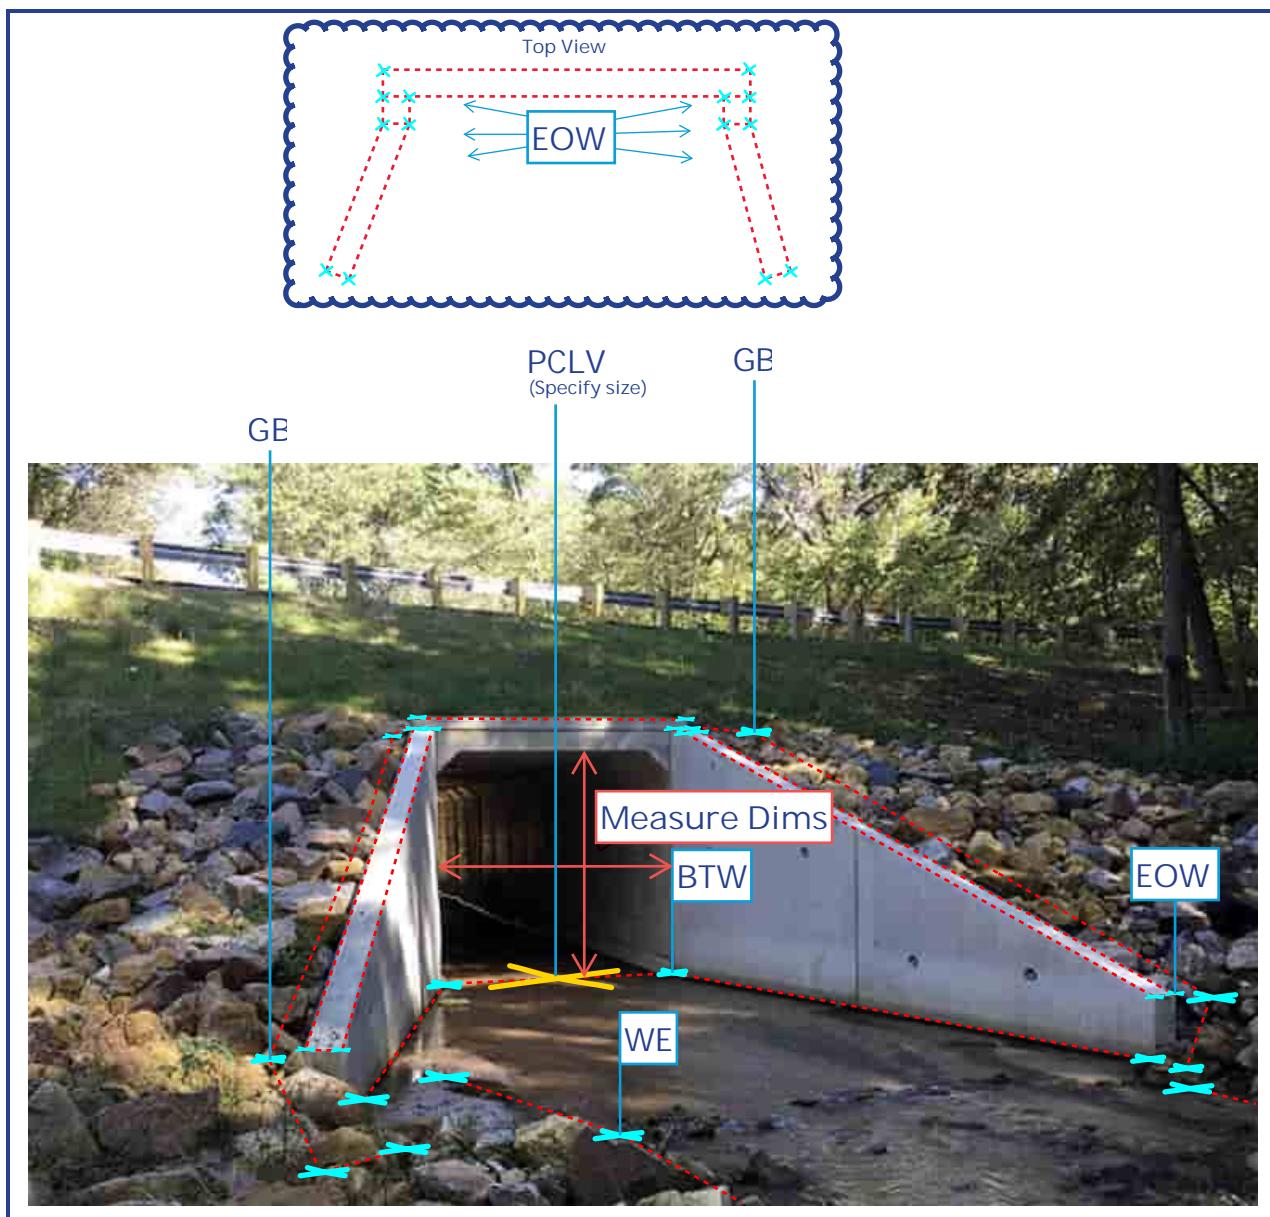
Image showing preferred way of measuring BOX CULVERT
